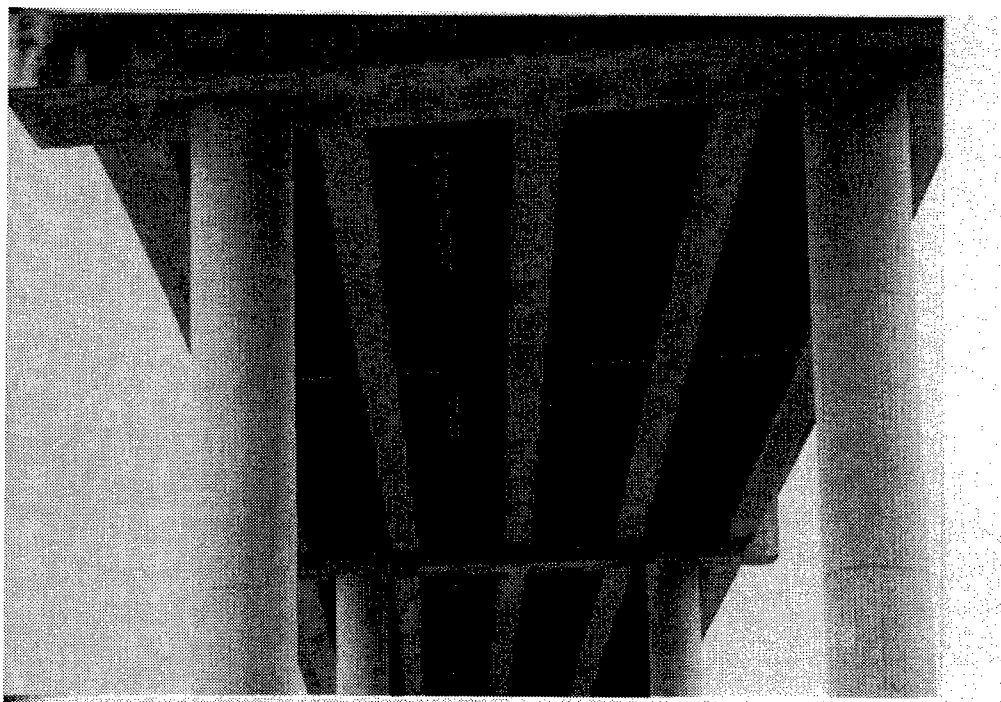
Transverse cracking is not found under the deck at the higher section of the structure.
